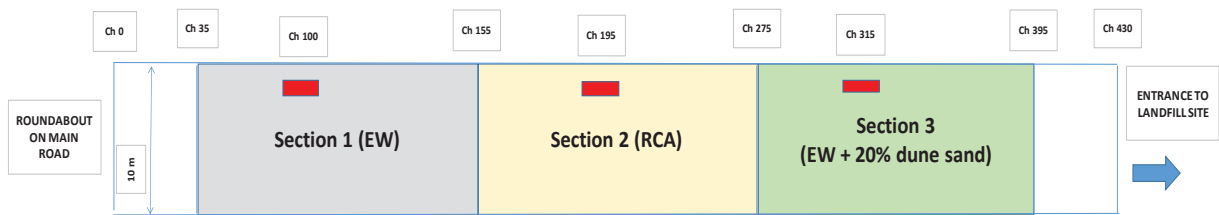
Layout of the subbase trial sections; red boxes represent sections tested after 4 years
